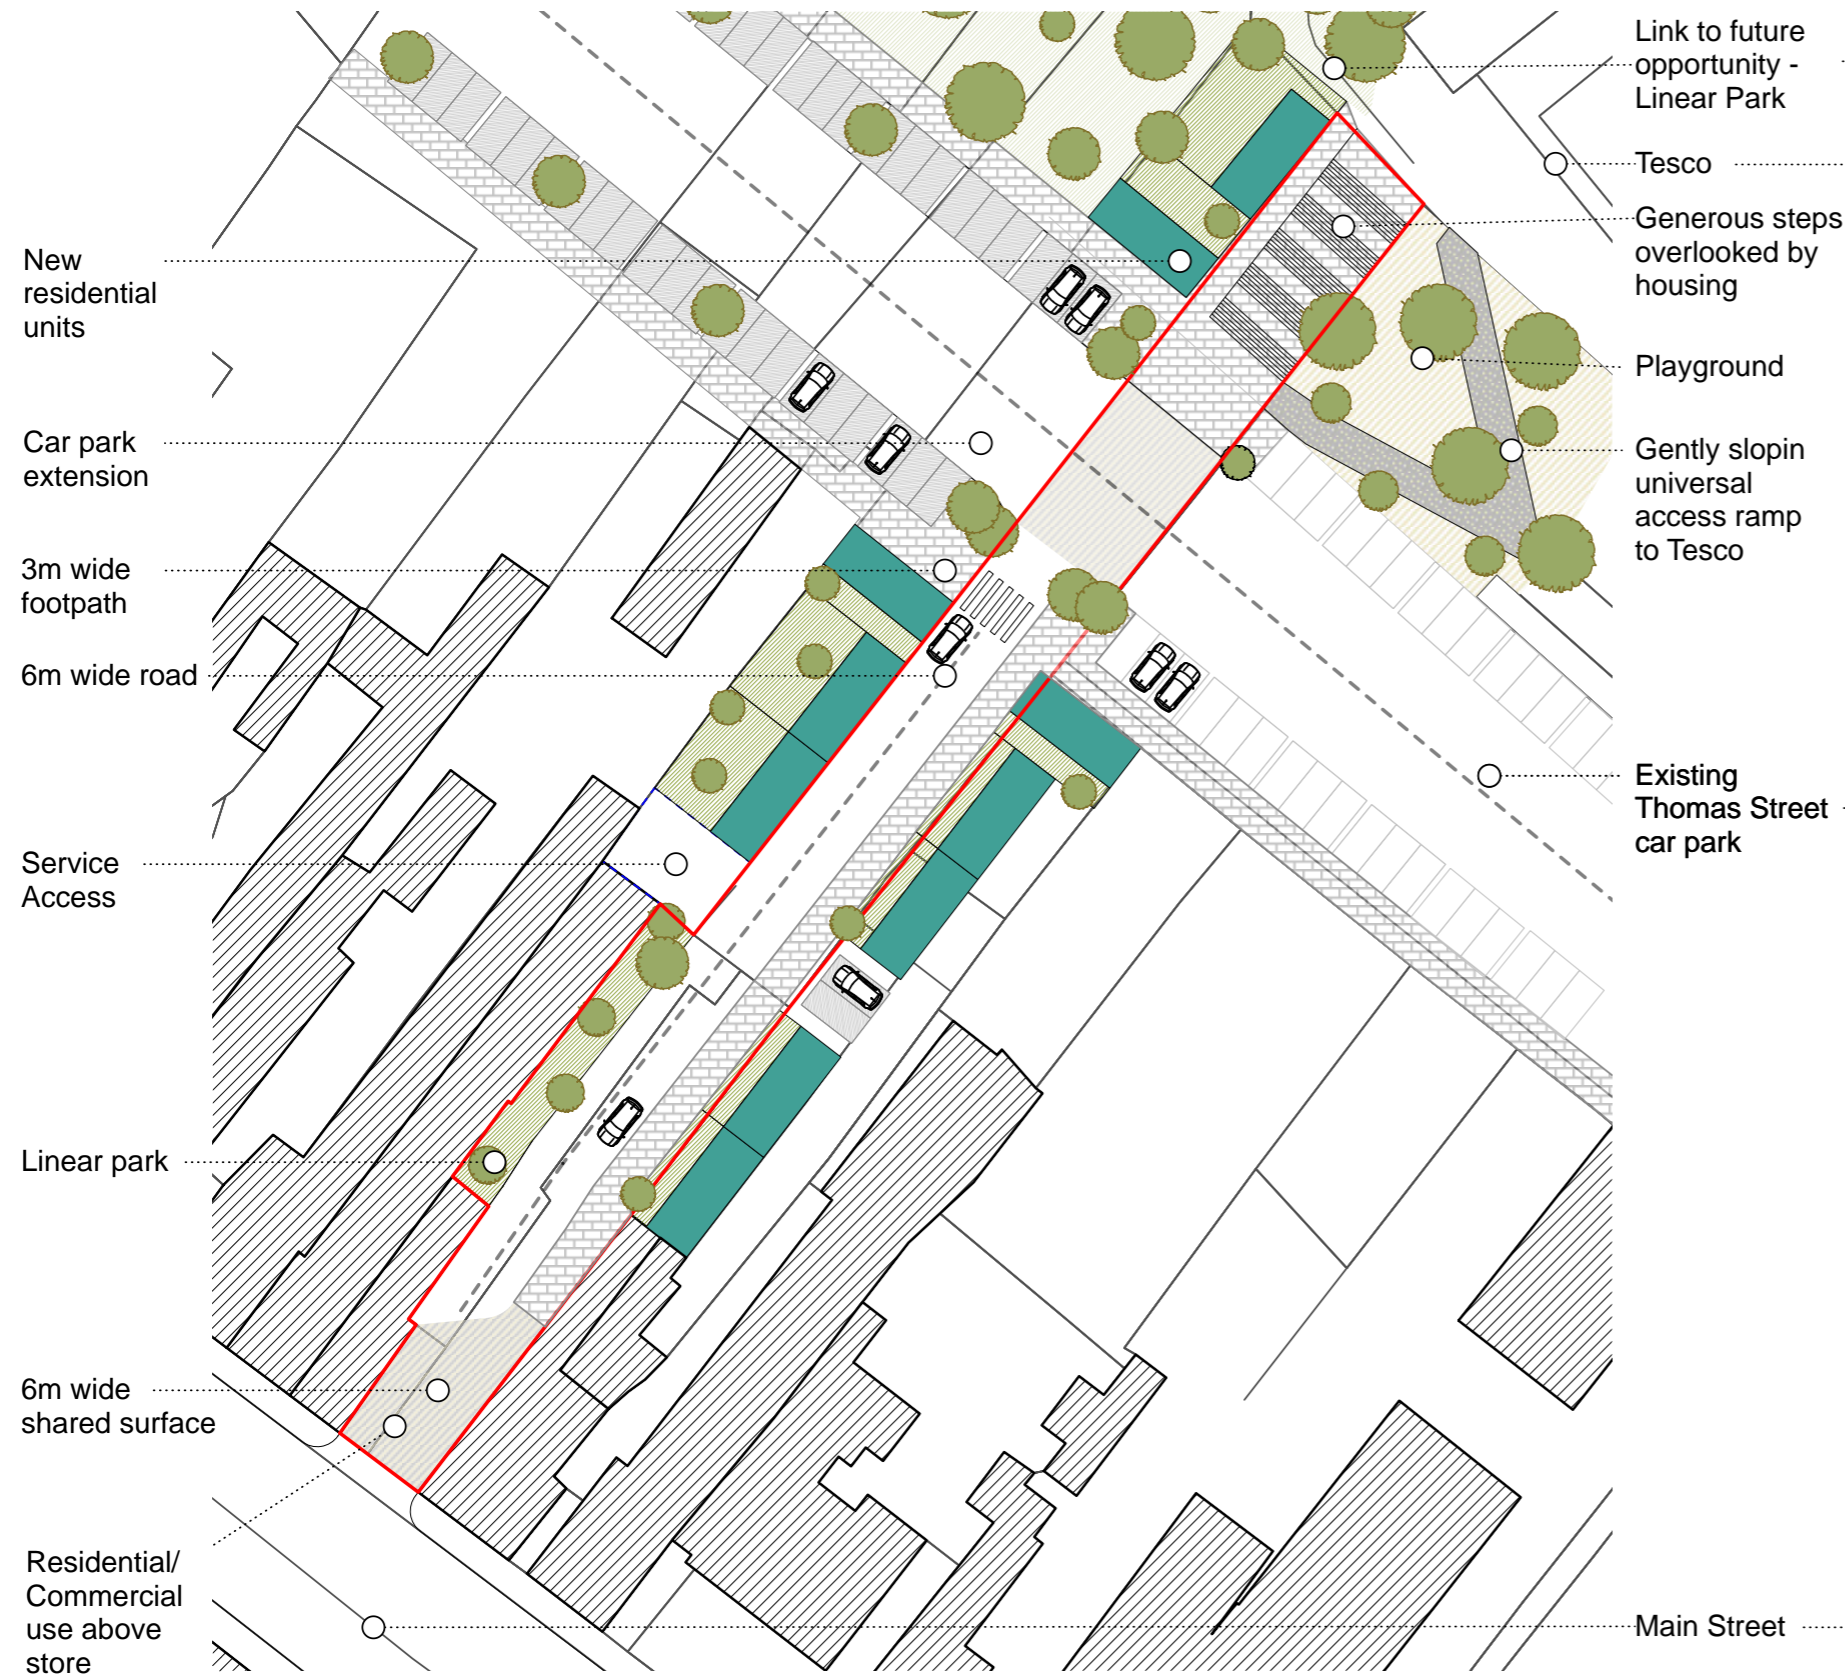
Artistic Impression of Backland Opportunity Site - Plan View - New Street with 2-Way Traffic
